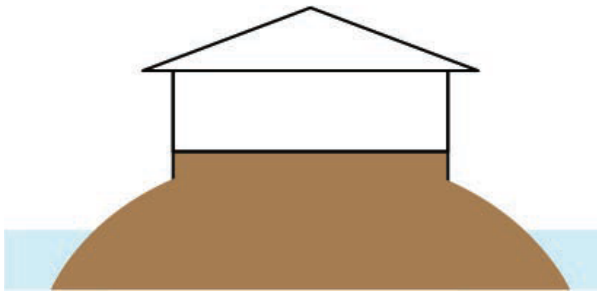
Mound New Construction* (NYC Department of Planning 2013a)
